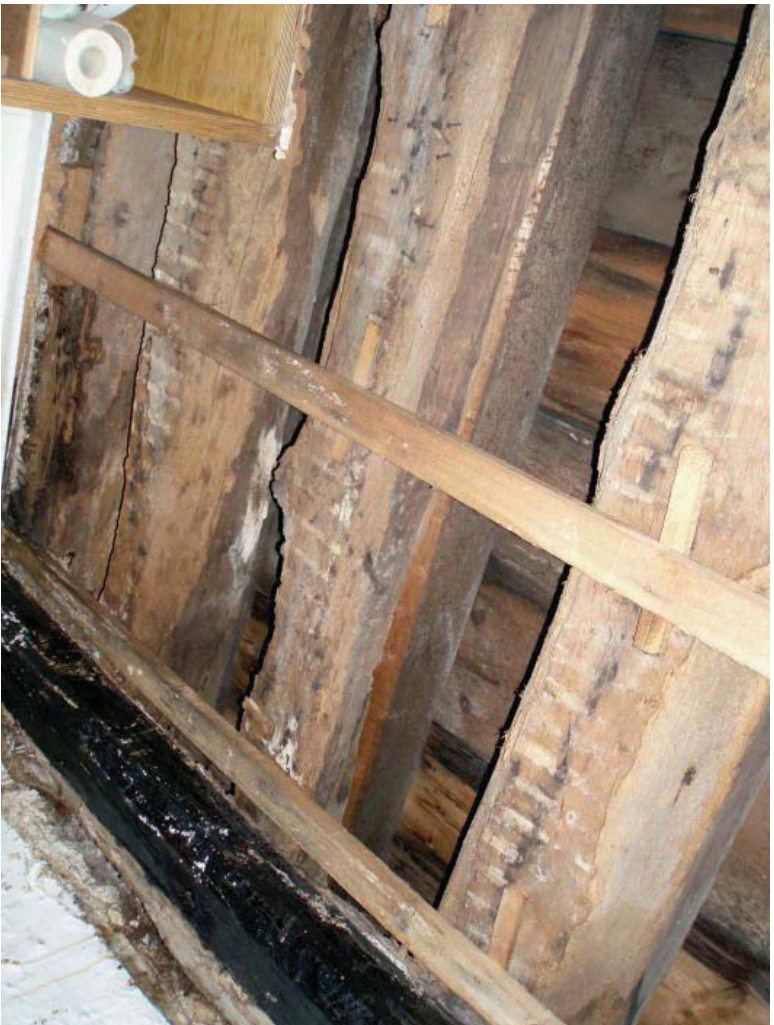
All Saints Vestry, Kingston: Roof timbers inside the vestry
